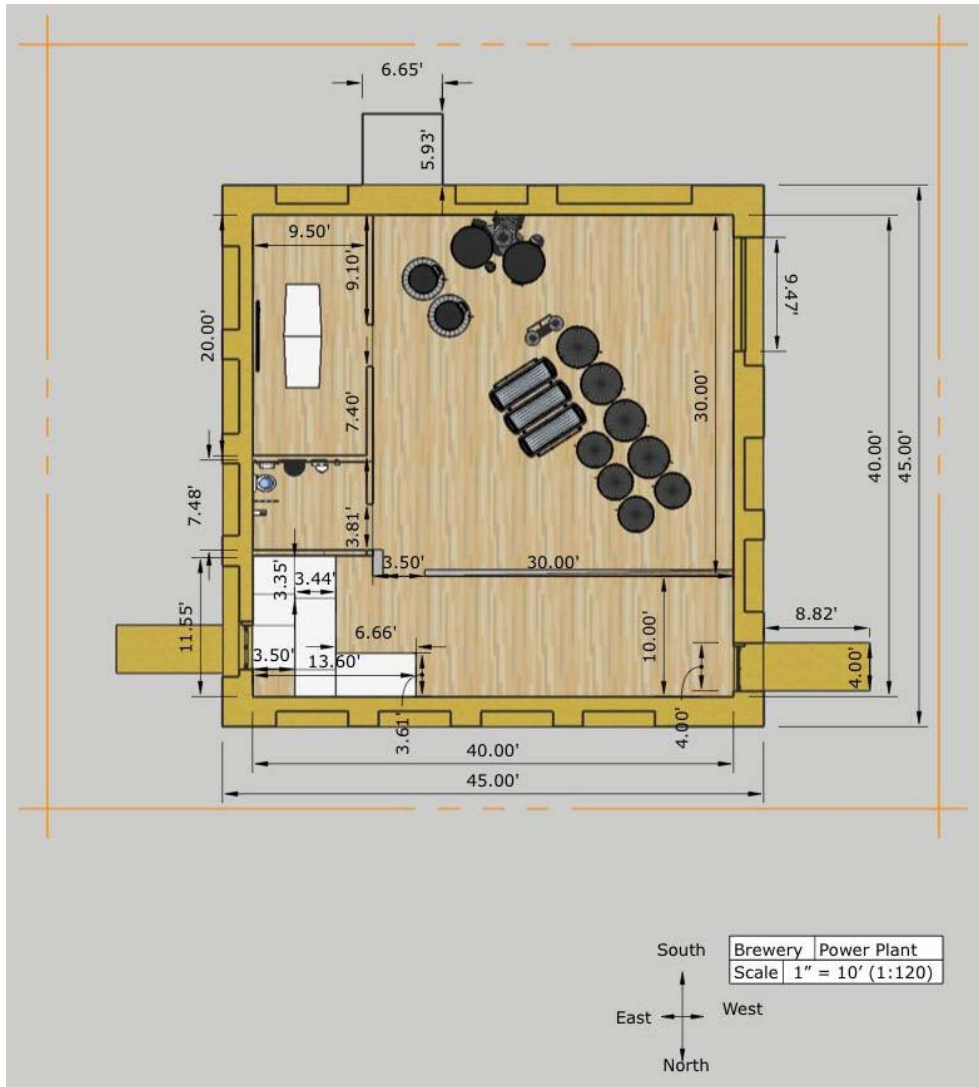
Floor plans of brewery including handicap ramps, employee break room, and unisex bathroom. A second internal handicapped ramp on the right side is not pictured. The elements in grey and dark grey are the brewing equipment. The employee break room is in the southeast corner (top right).
